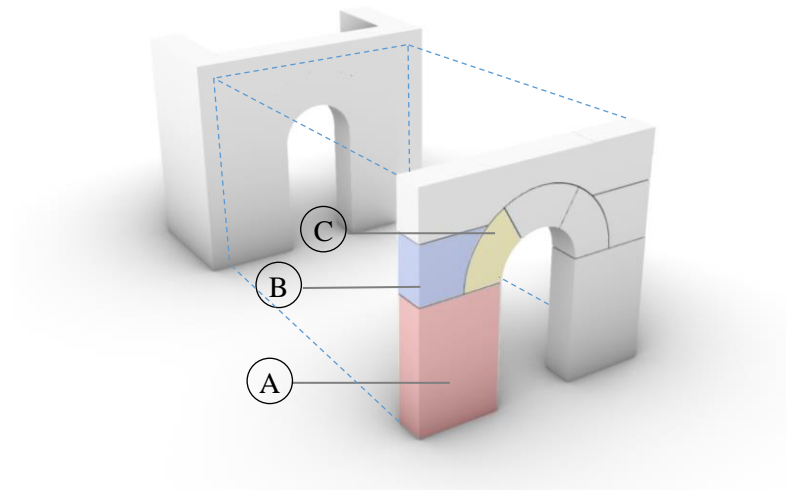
Geometry challenges in a regular cob wall with an opening. 1) Lift height- 3 axis 3D printing; 2) Inclined 3-axis printing (corbelling); 3) Inclined 6-axis 3D printing.
